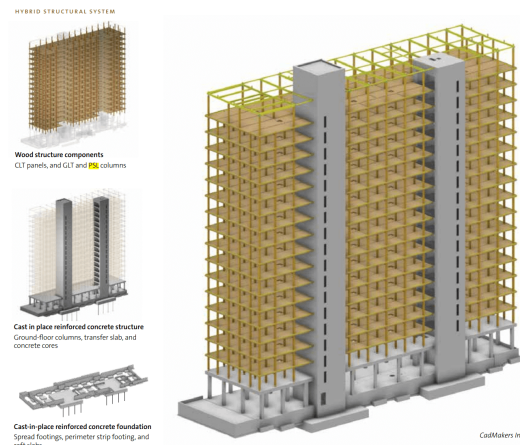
Structural system of Brock Commons Tallwood House [3]
